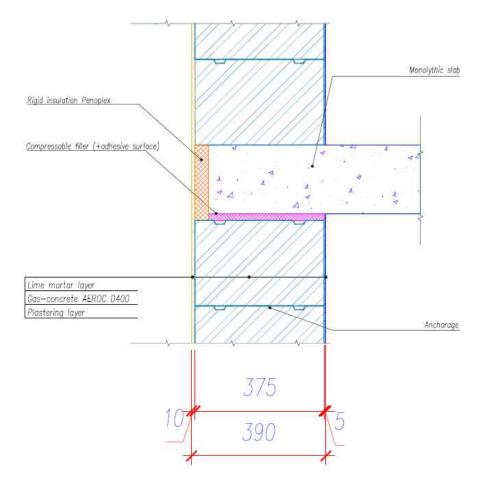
Hakkapeliitta village's non bearing exterior wall.
